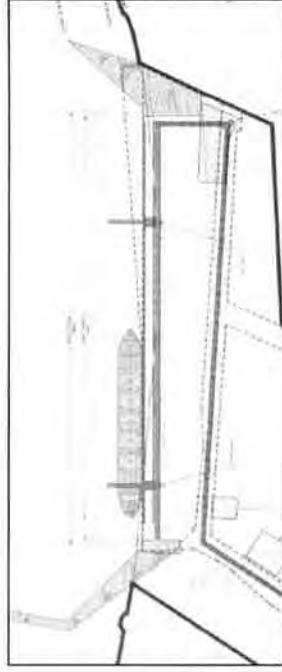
Section/Elevation Showing Proposed Solid Quay Structure
